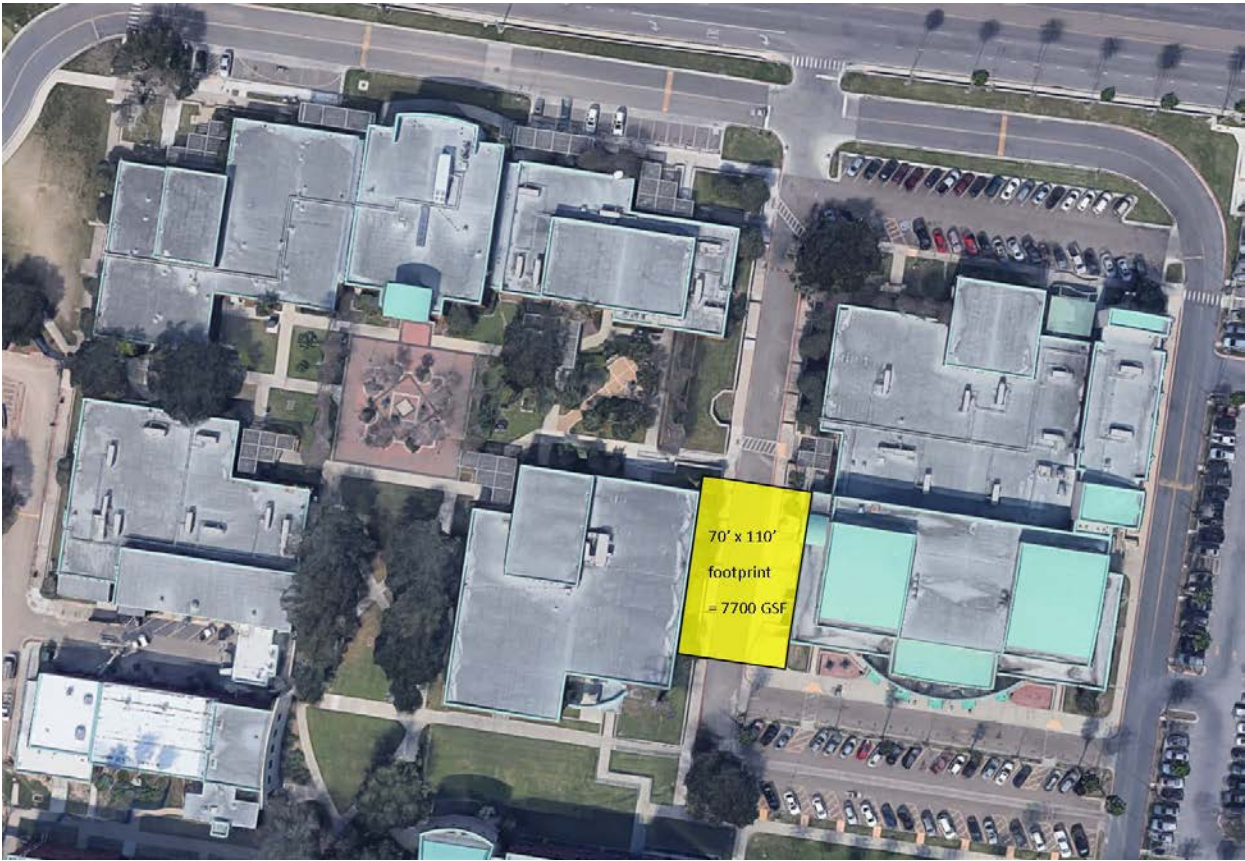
Aerial view showing potential footprint of new construction connecting the CLE and Library buildings.
